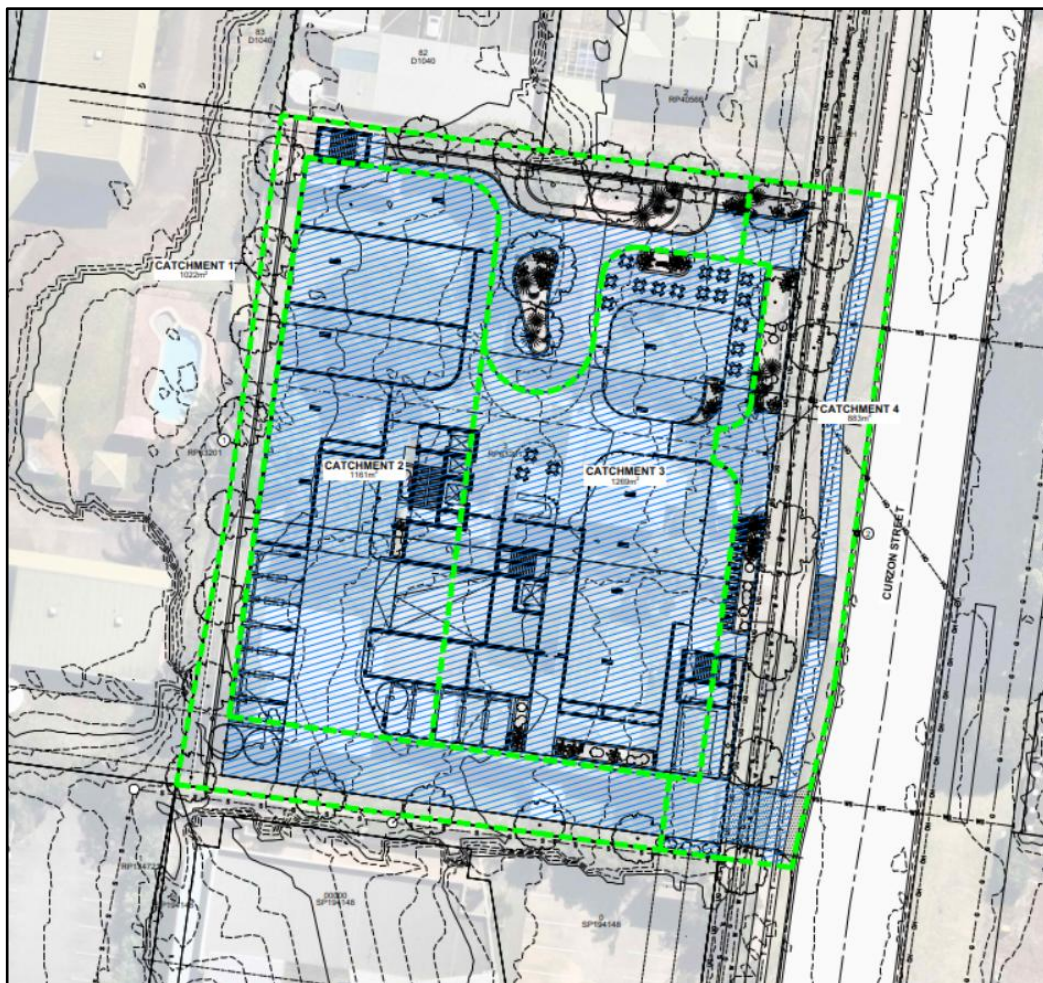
POST-DEVELOPED STORMWATER CATCHMENT PLAN
